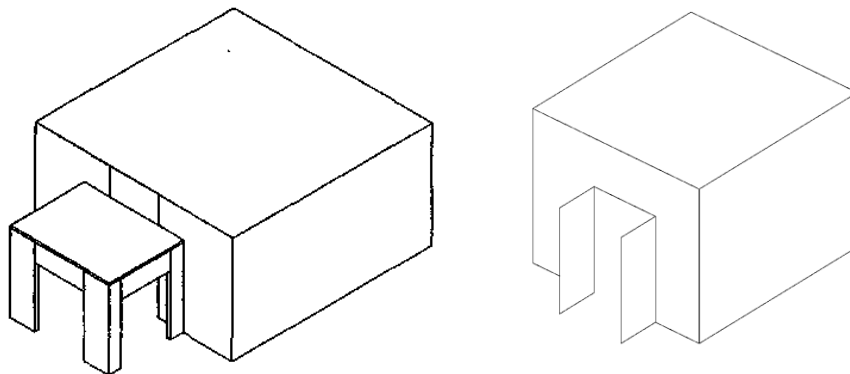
Building entrance model with vestibule (Yuill, 1996) and single door.
